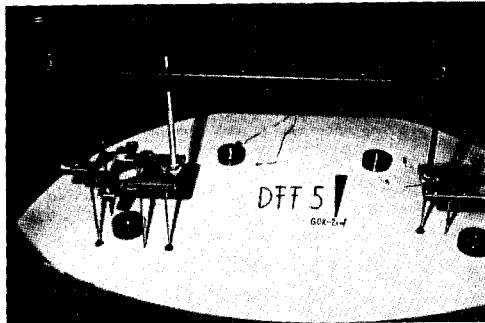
Photo of the installation of LVDT's and acceleration transducers at the defined depth for the tests on dynamically loaded foundations
